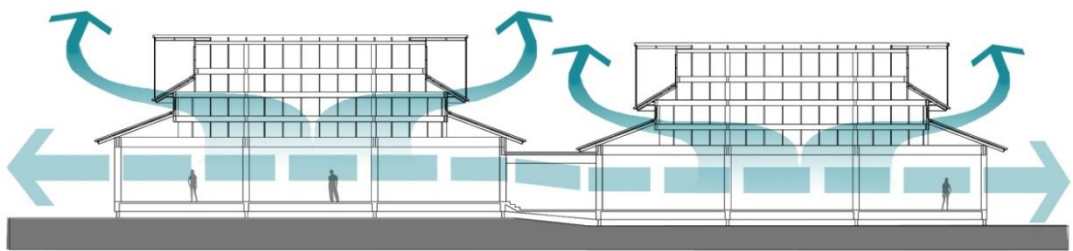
Wind diagram shows in cross section of OPD hallway and the support facility
